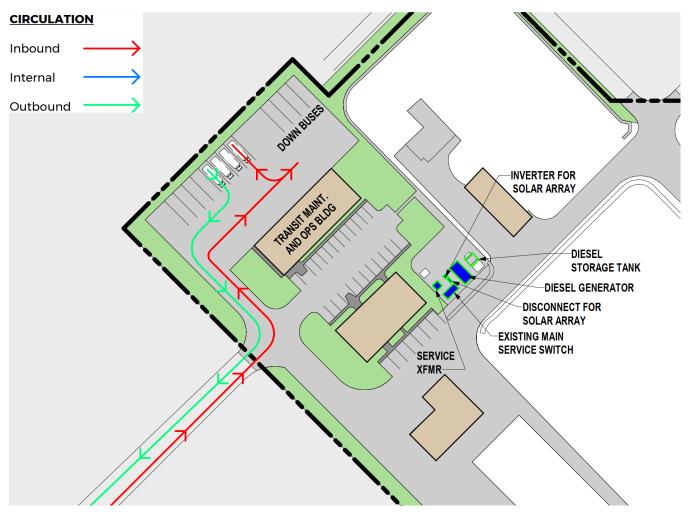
Rio Vista Delta Breeze Existing Facility and Site Circulation
